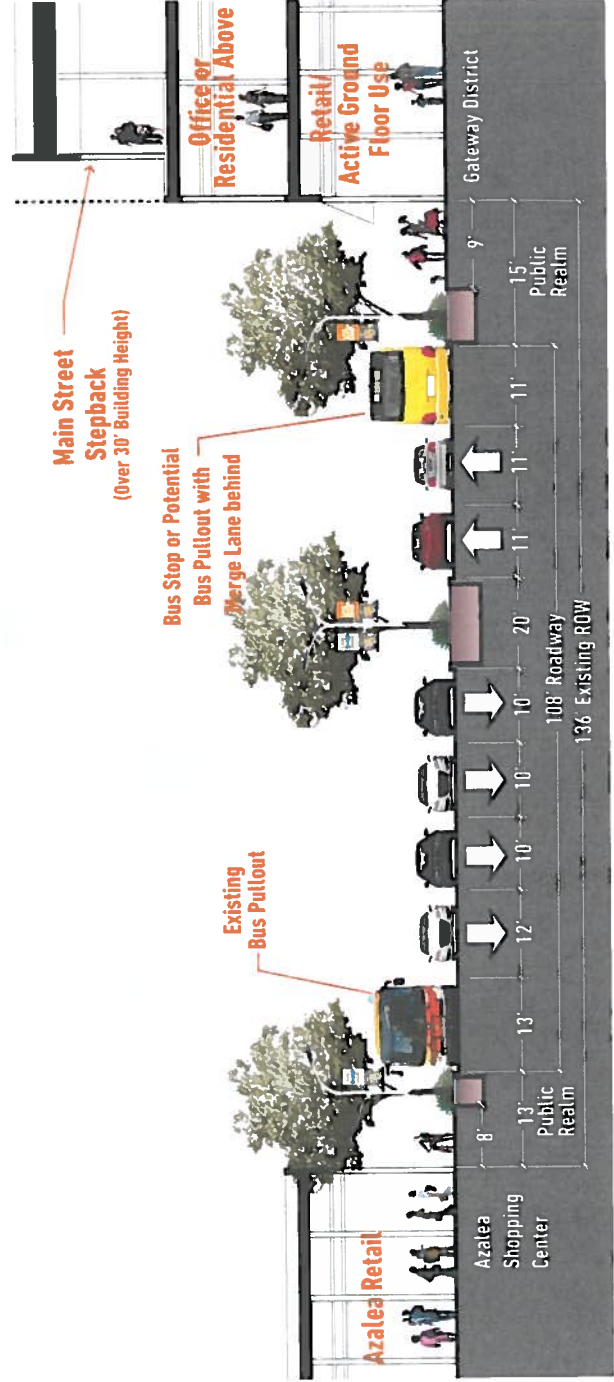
Atlantic Avenue Future Improvements Cross Section
